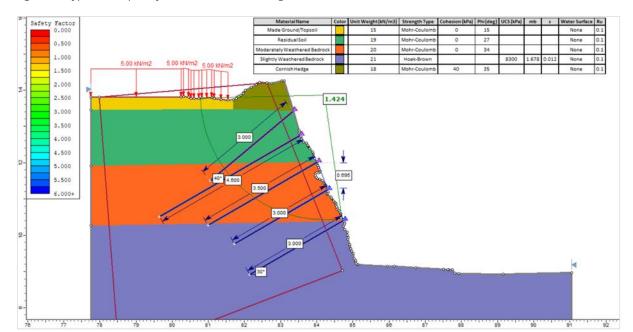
Typical Temporary Works Soil nails Arrangement - Section 5
